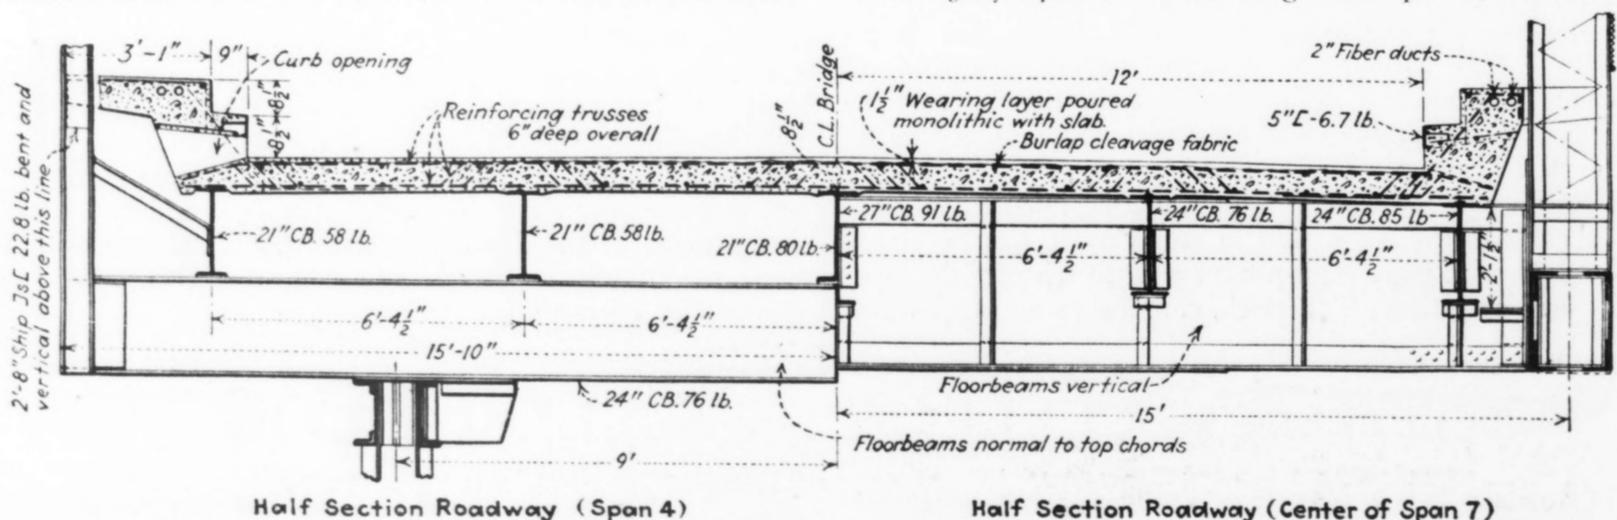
TYPICAL CROSS-SECTIONS OF DECK
